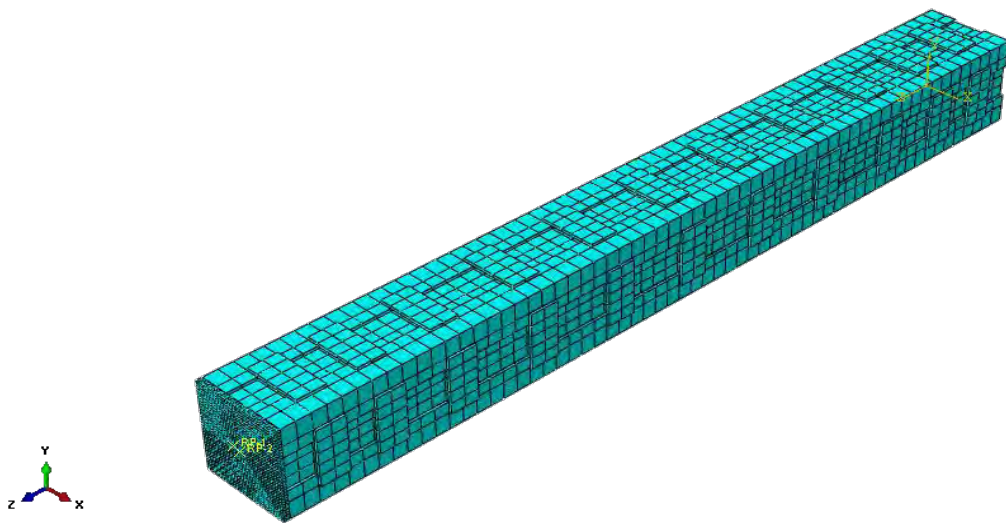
Mesh of steel angle and strip jacketed RC column
